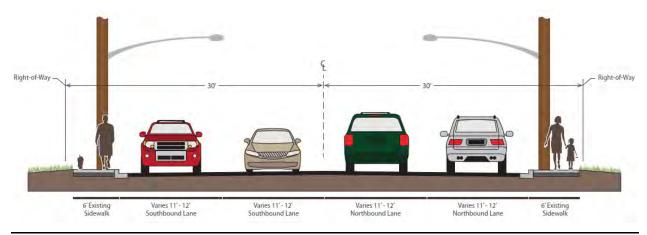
Existing Typical Section – Segment 2 (south of Warren Avenue Bridge)
